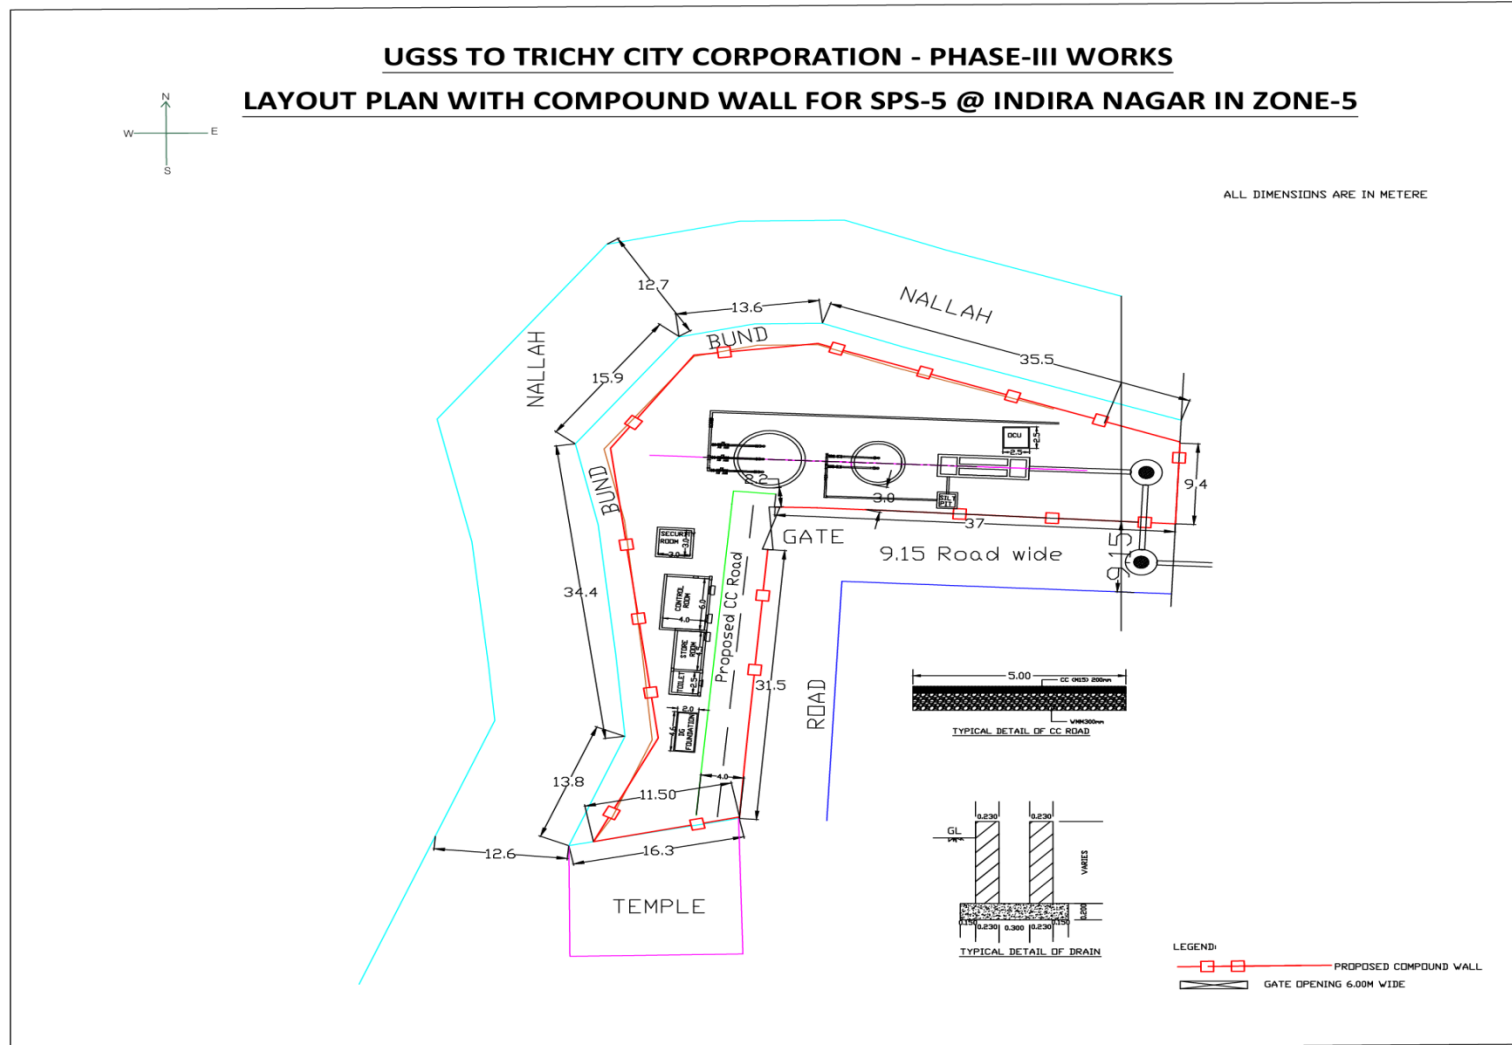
Layout Plan on revenue map for Sewage pumping stations7
